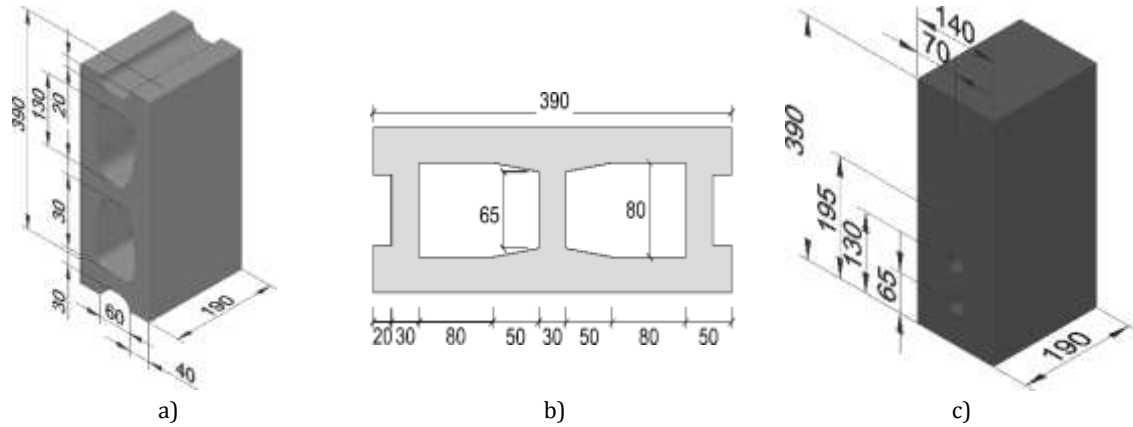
2. Concrete Blocks. a) Hollow block b) Simplified cross section c) Deviator and anchorage blocks (units: mm)
